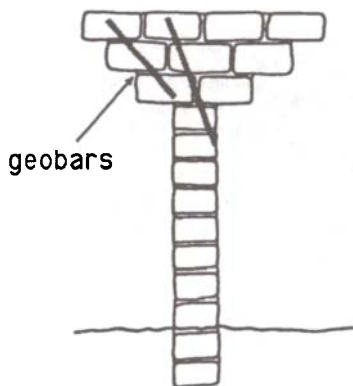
Schematic diagram of test walls containing structural reinforcing elements.
